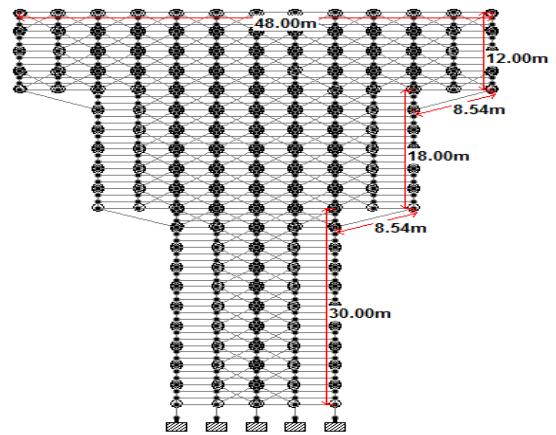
ELEVATION OF THE STRUCTURE WITH BRACING AND BUNDLE TUBE WITH PINNED CONNECTION
